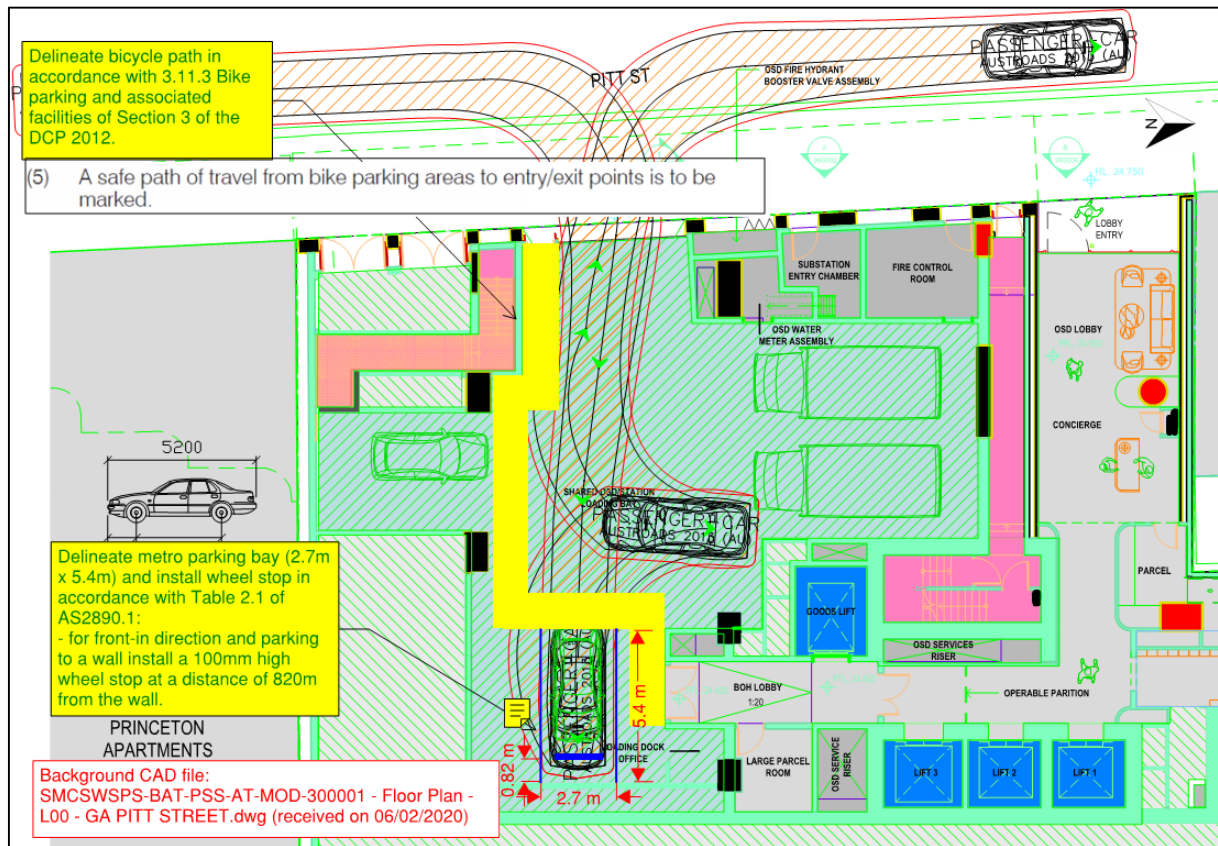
Bike parking access proposed via the loading dock (dedicated door)
